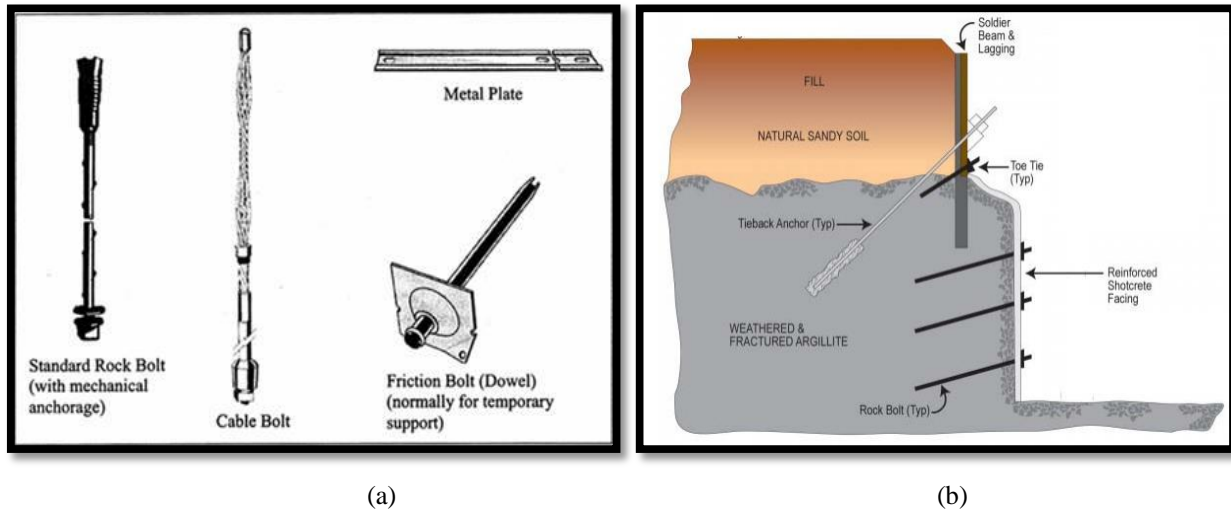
Rock bolt use in slopes. (<http://www.moretrench.com>). (a) Standard rock bolts. (b) The role of bolts in strengthening slopes.
